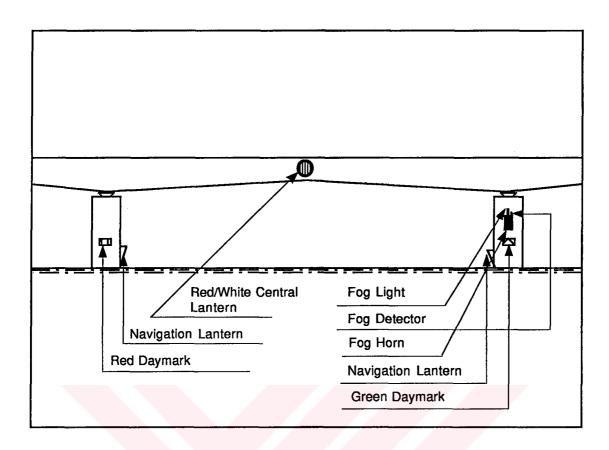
NAVIGATION EQUIPMENT MOUNTED ON THE NAVIGATION SPAN OF THE GREAT BELT WESTERN BRIDGE
